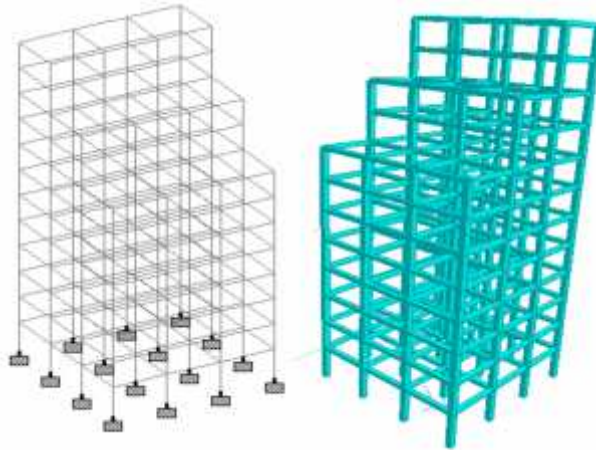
Multi- story G+11 Building model in STAD PRO Vi8
